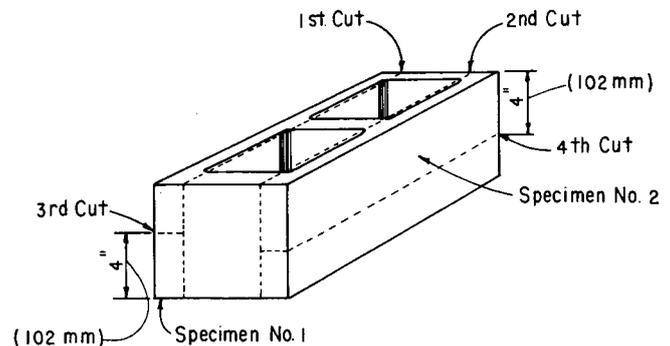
View of sawed block showing a suggested sequence of cuts and location of two half-face shell specimens. From ASTM C 426, vol. 04.05, 1984.
